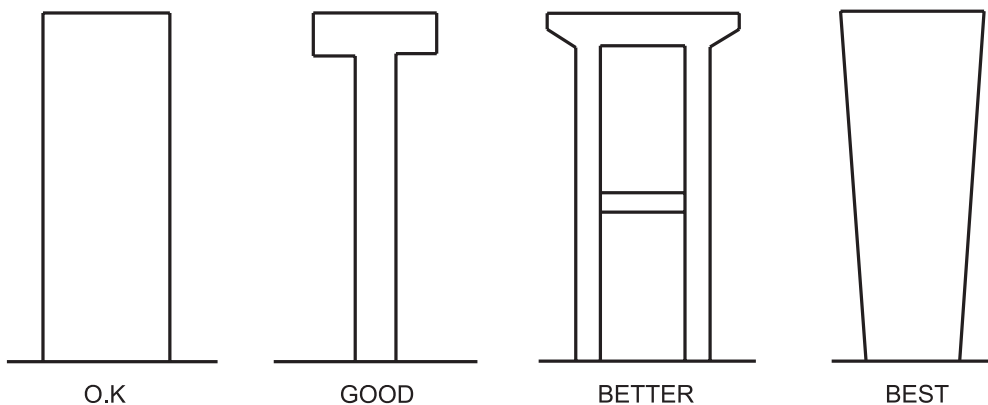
Selection of pier type frame, wall, and hammerhead shapes.
